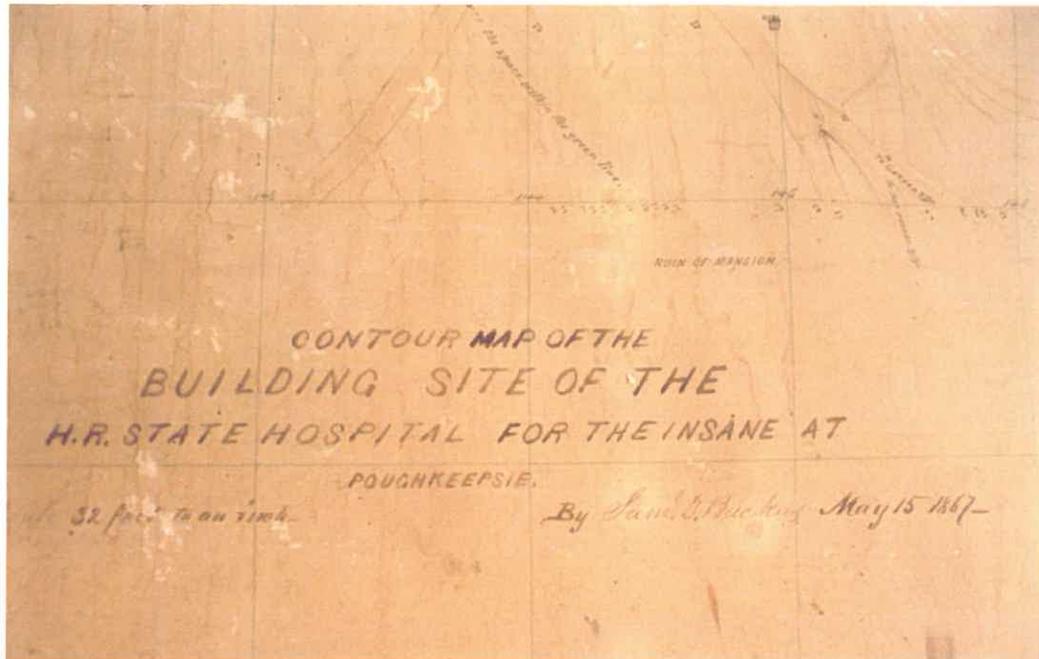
1867 Backus site plan, title block. Note roads and ruin of mansion.
